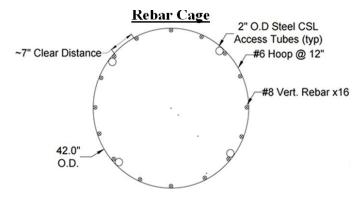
Illustration. Initial design cross section of test shaft #1 with reinforcement detail.
